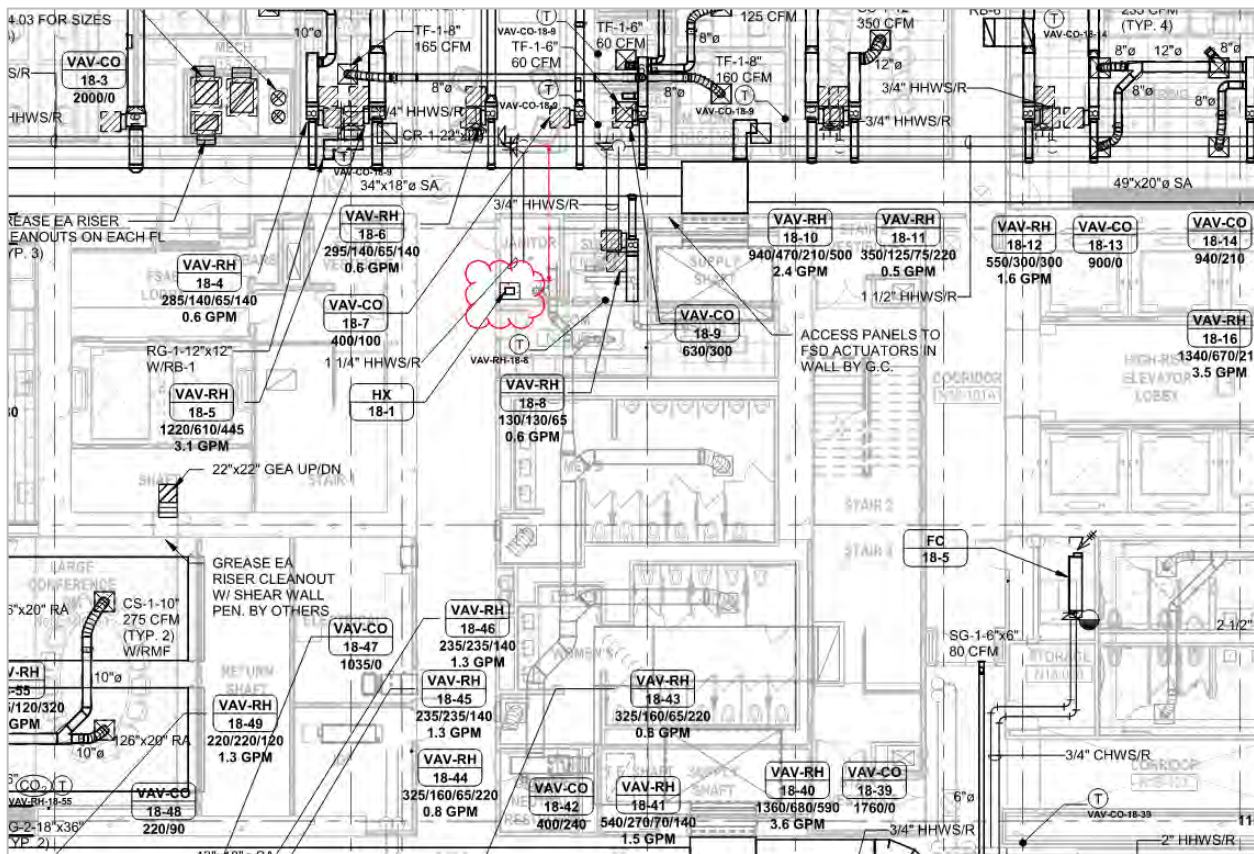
San Jose Building "A" Mechanical Drawing Level 18
